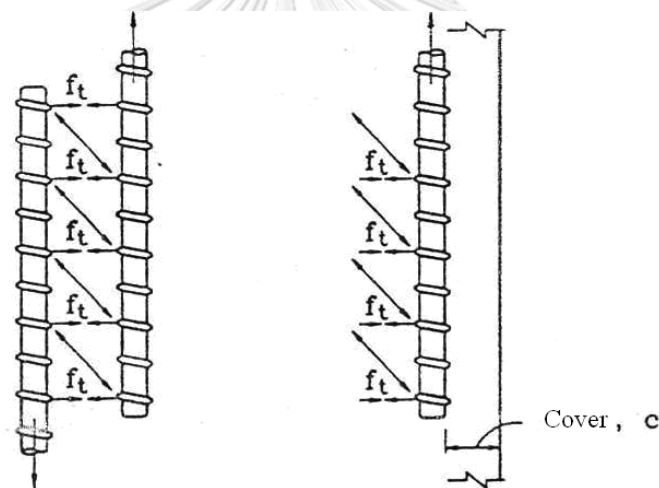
Force transfer in lap splice (Priestley et al. [79]).
